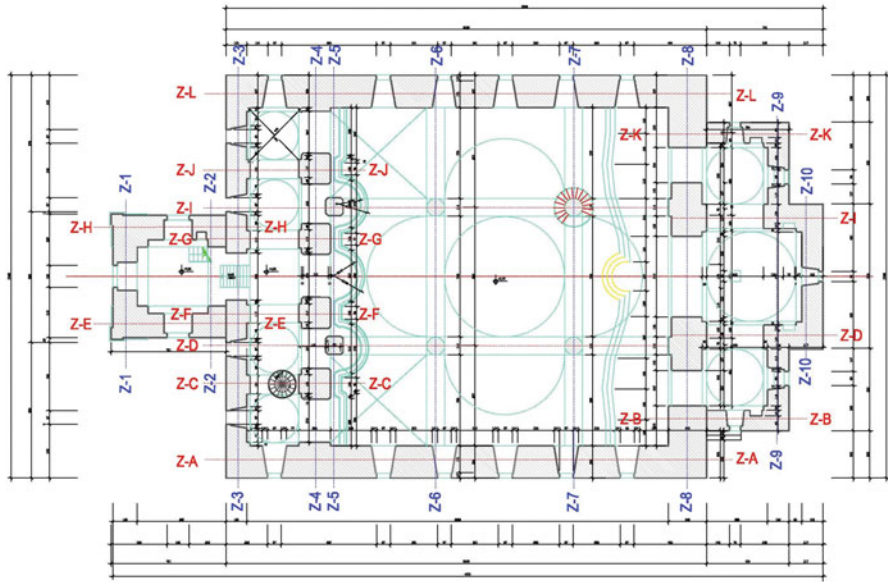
Ground floor plan of the designed church structure of the Holy Trinity in Mostar
